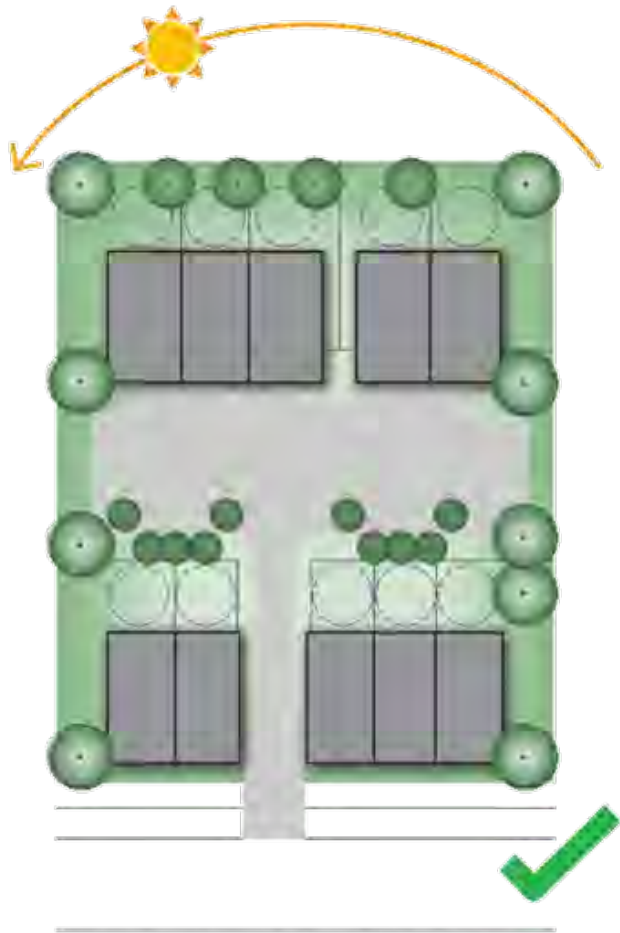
A north, east or west orientation for individual outdoor living spaces provides better solar access. Tree, shrub and groundcover planting softens the appearance of hard surfaces.
